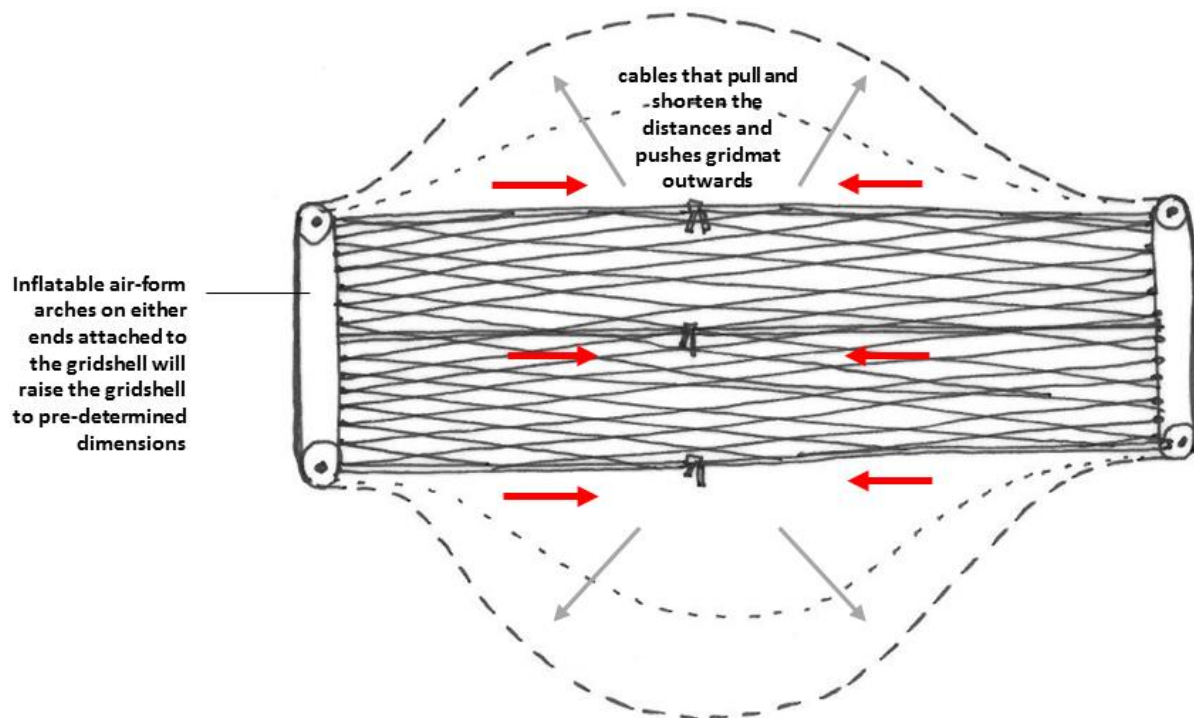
tubular gridshell formwork flares out deployed through the effect of shortening steel cables that connect the opposite edges of the gridmat together. Bracing sections will be added afterwards to provide in plane rigidity whilst the concrete is being applied.
